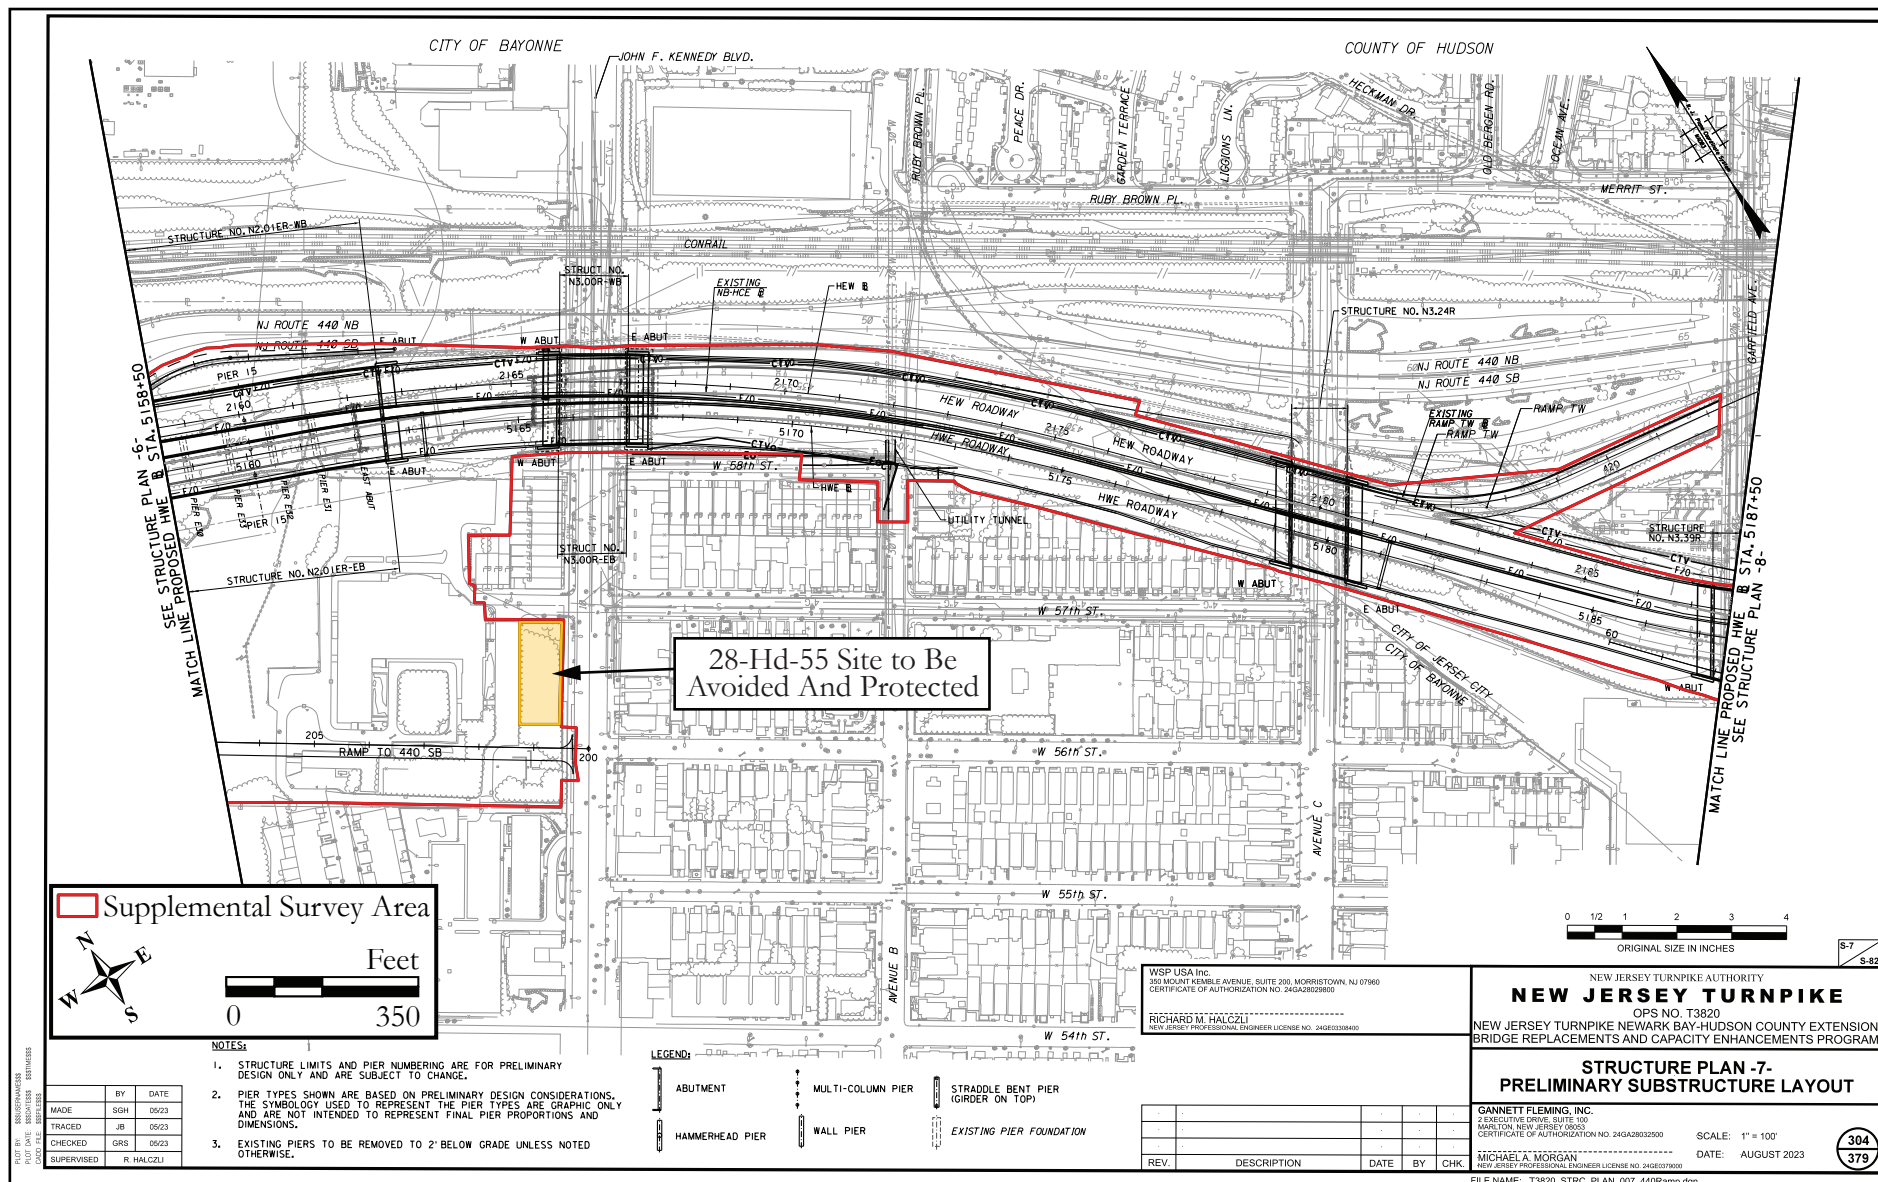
Structure Plan, Preliminary Substructure Layout showing the Supplemental Study Area (Gannett Fleming, Inc. 2022d).
